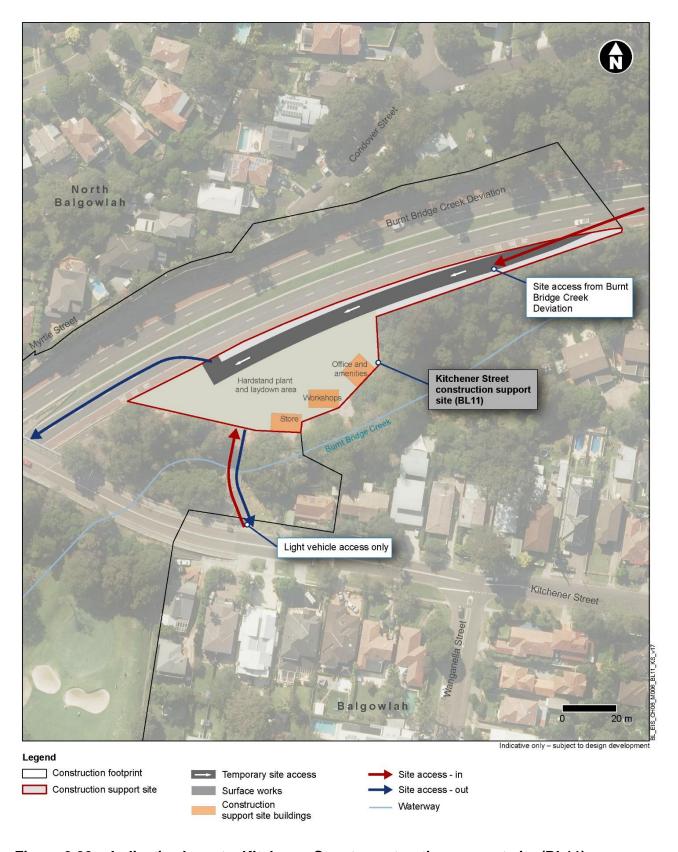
Indicative layout – Kitchener Street construction support site (BL11)
